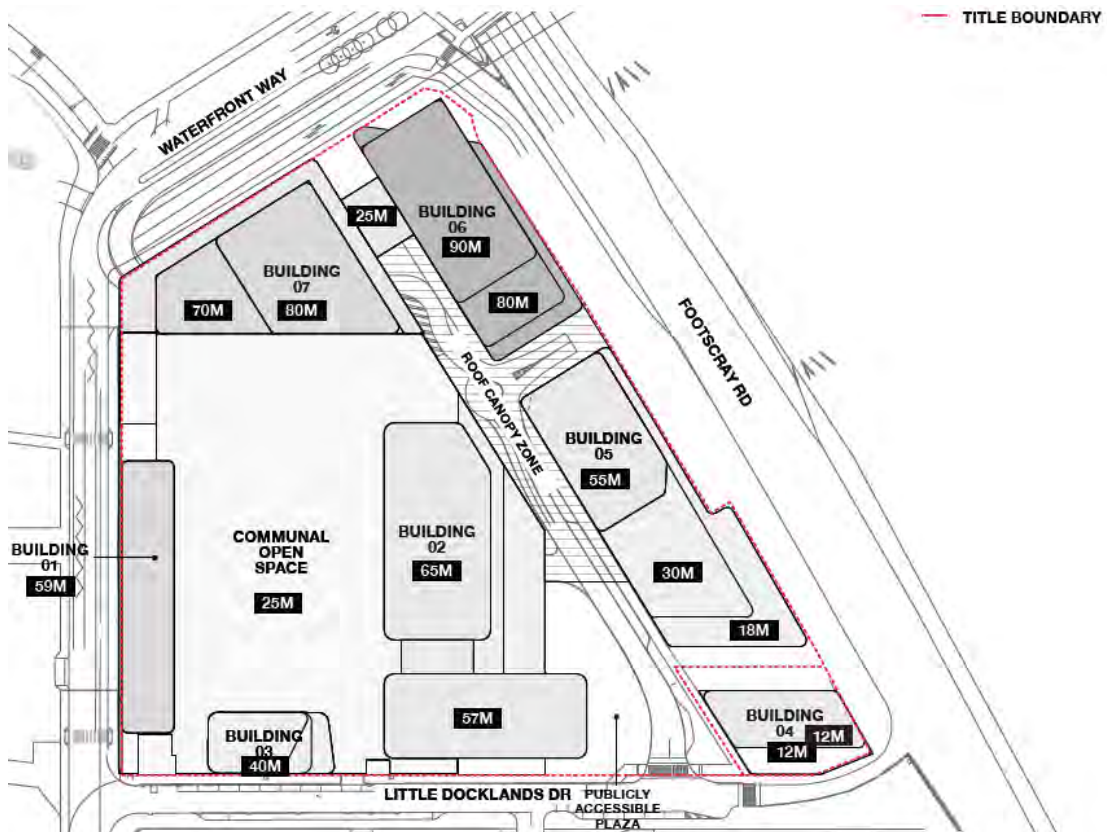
DP Addendum Concept Plan 5 - Maximum heights, roof plan
